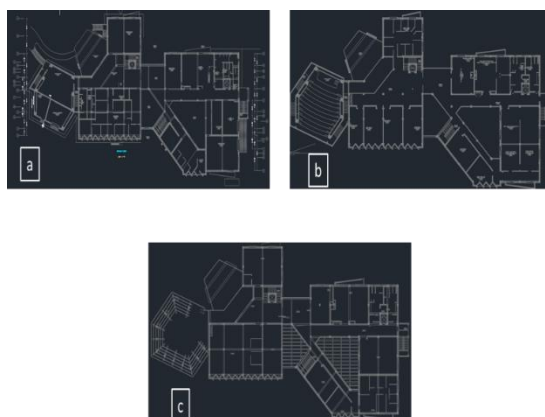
Plans for case study building: (a) Composite layout showing the Ground floor; (b) First floor; (c) Second floor.
